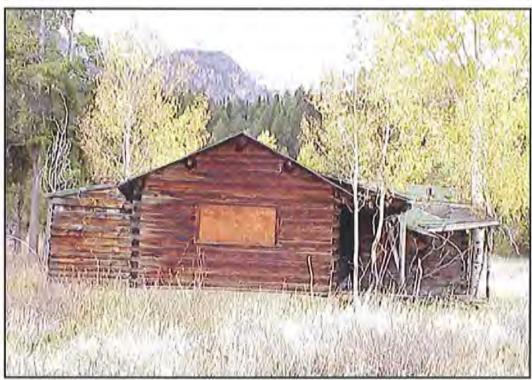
East side of HS-1160, Cabin 8. Source: A&E Architects, 2004.
